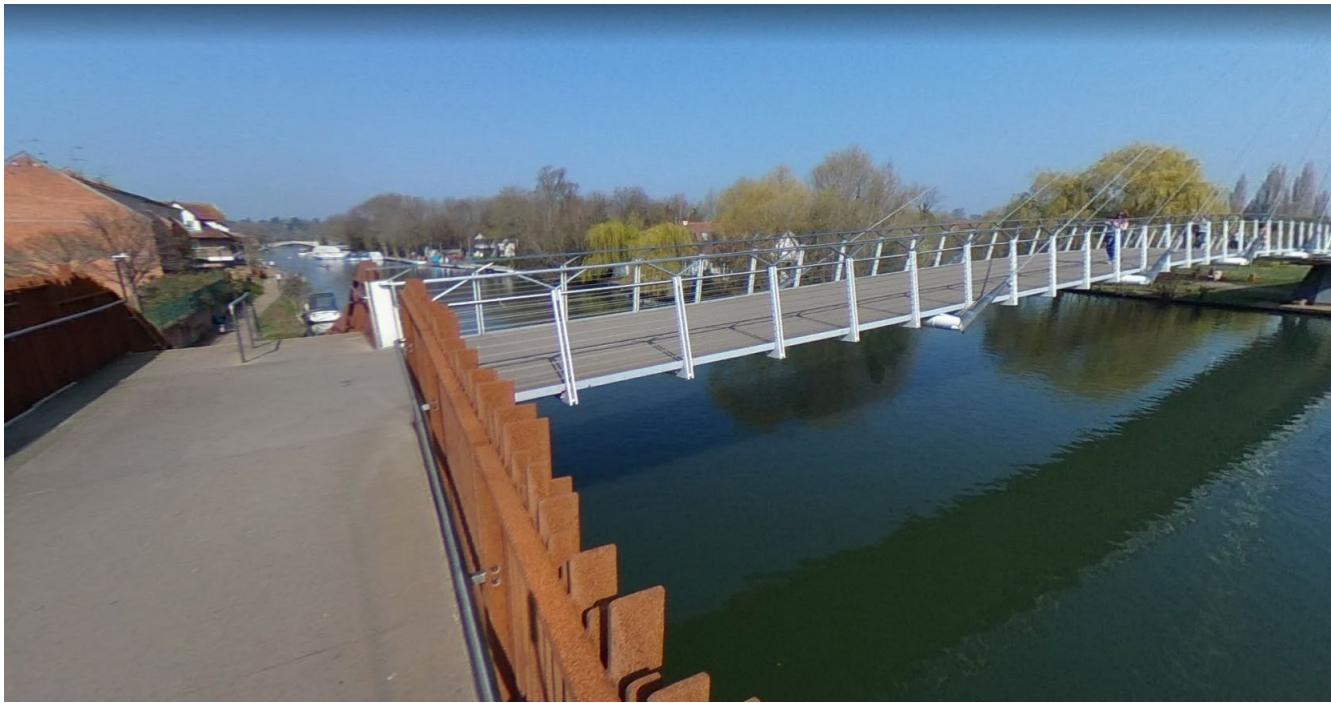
Aerial image of 90 degree bend on Christchurch Bridge
